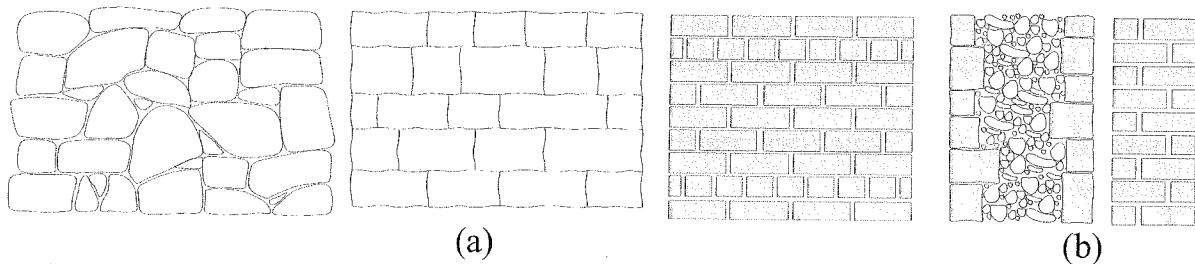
Different masonry bond: (a) bond in the wall face; (b) internal structure
